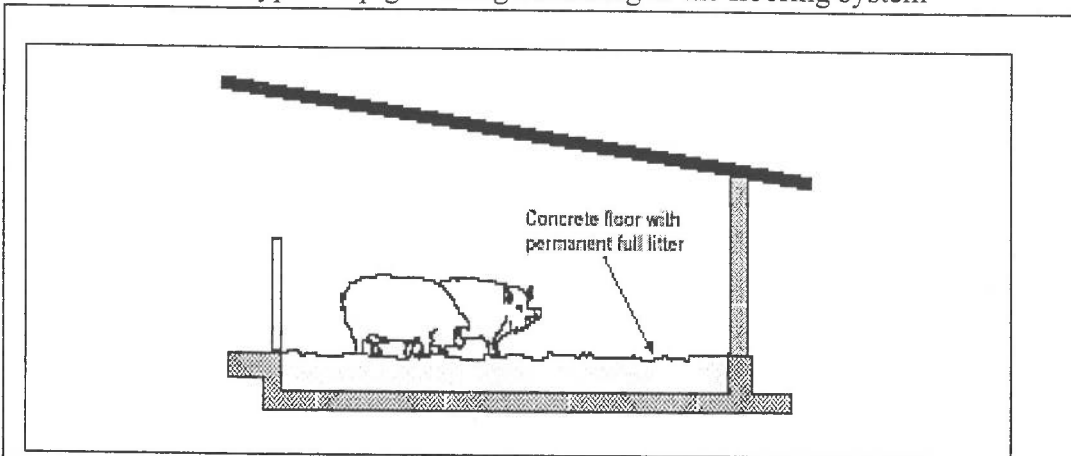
A – Straw based systems: solid concrete floor and full litter
